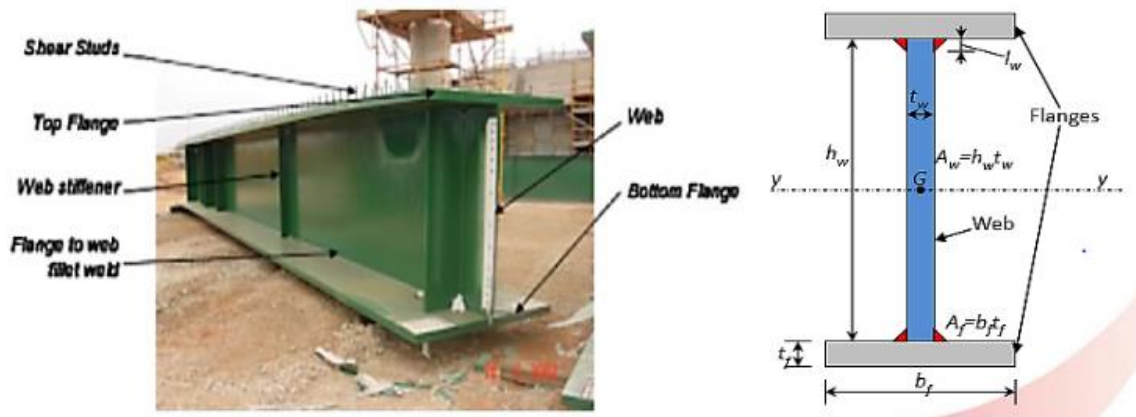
Cross section of a typical plate girder (Chi, 2014)
